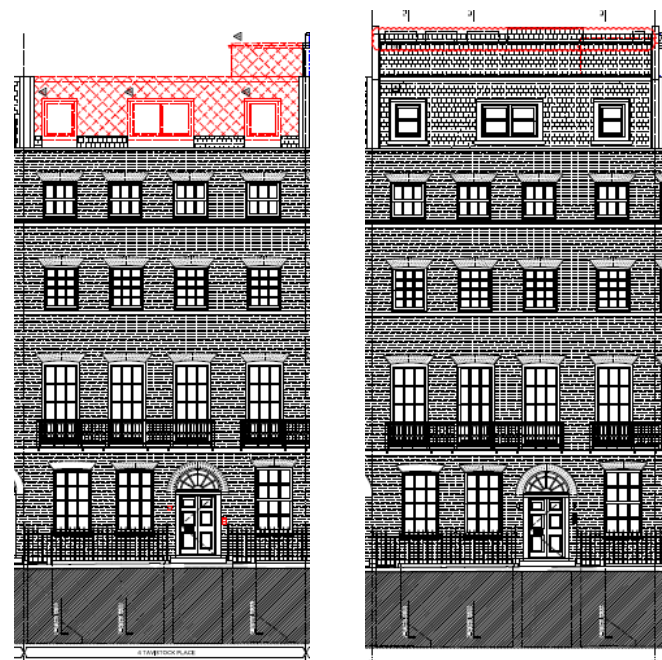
Existing Elevation (L) Proposed Elevation (R)
